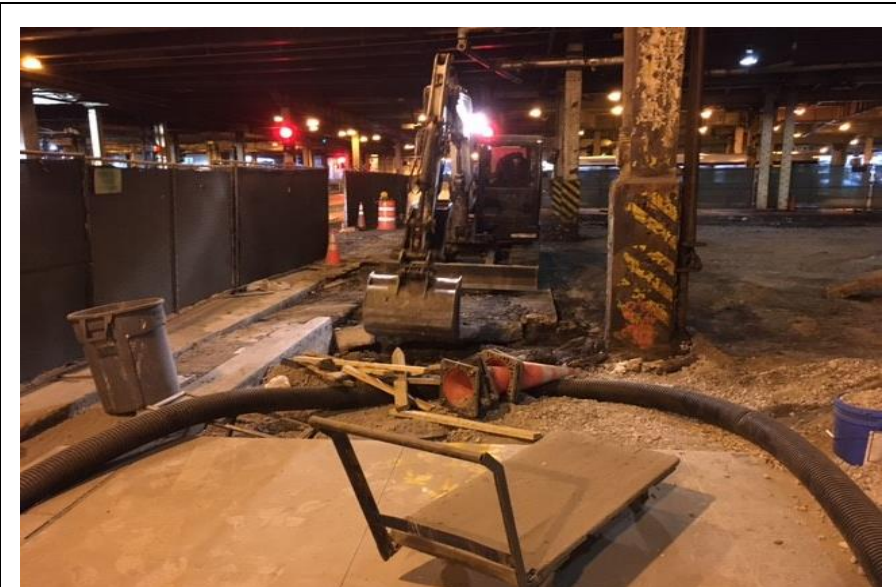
12/30/2020 – Removed concrete from West & South Sides of Work Area
